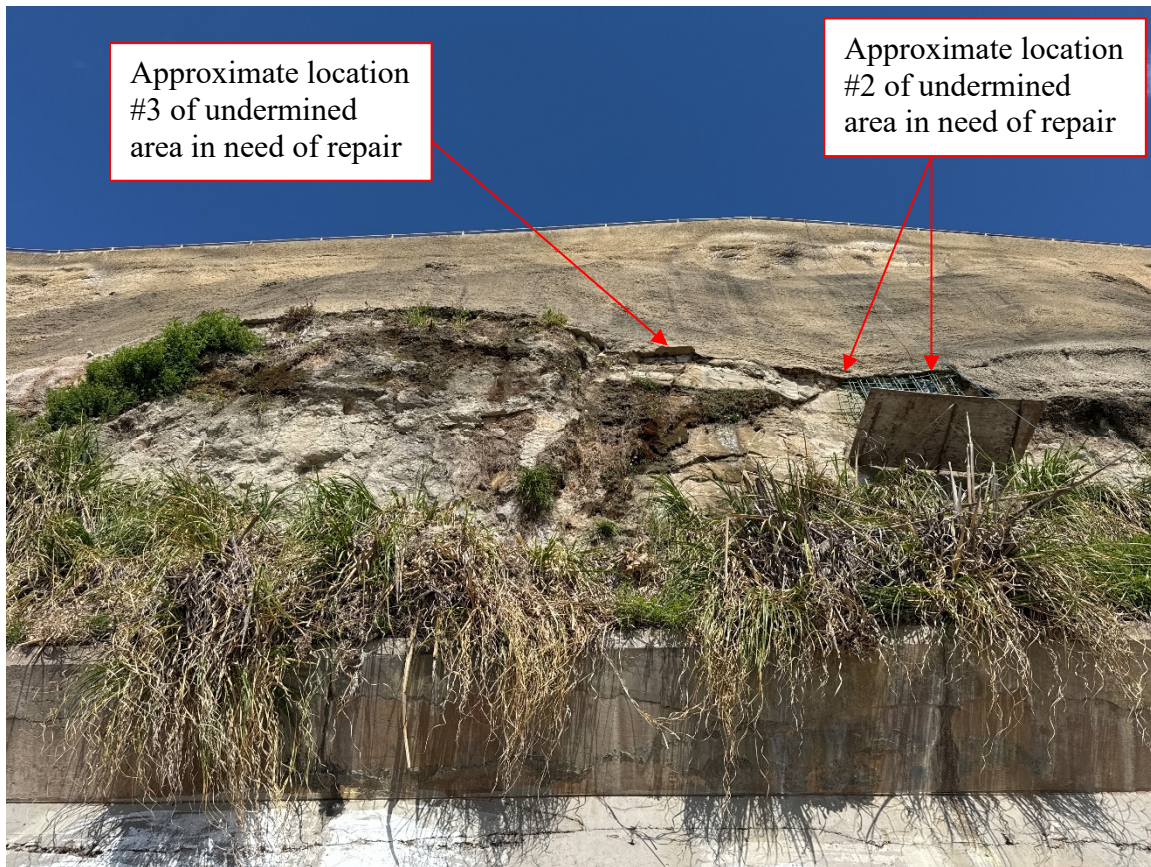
Repair Locations #2 & #3 View - 2 April 2025
